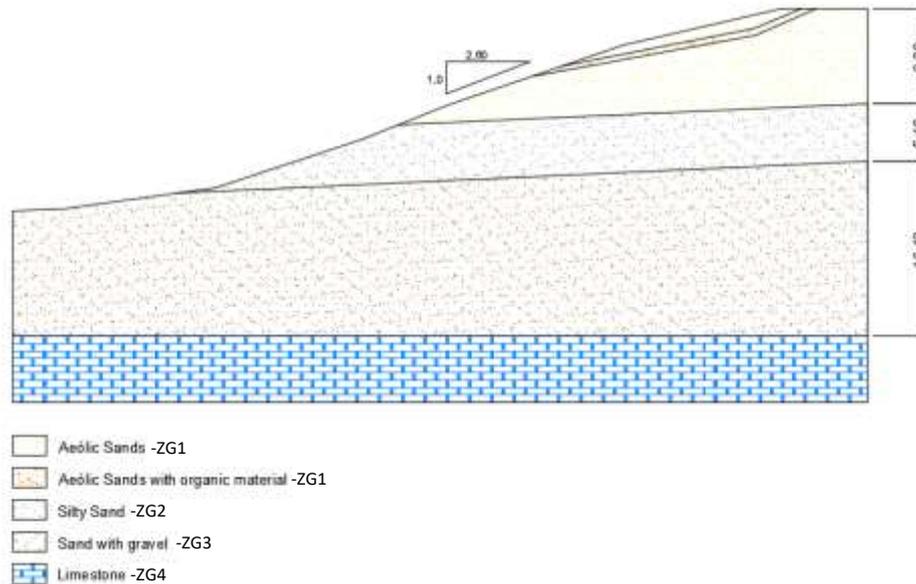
SLOPE CROSS SECTION AND GEOLOGICAL PROFILE
